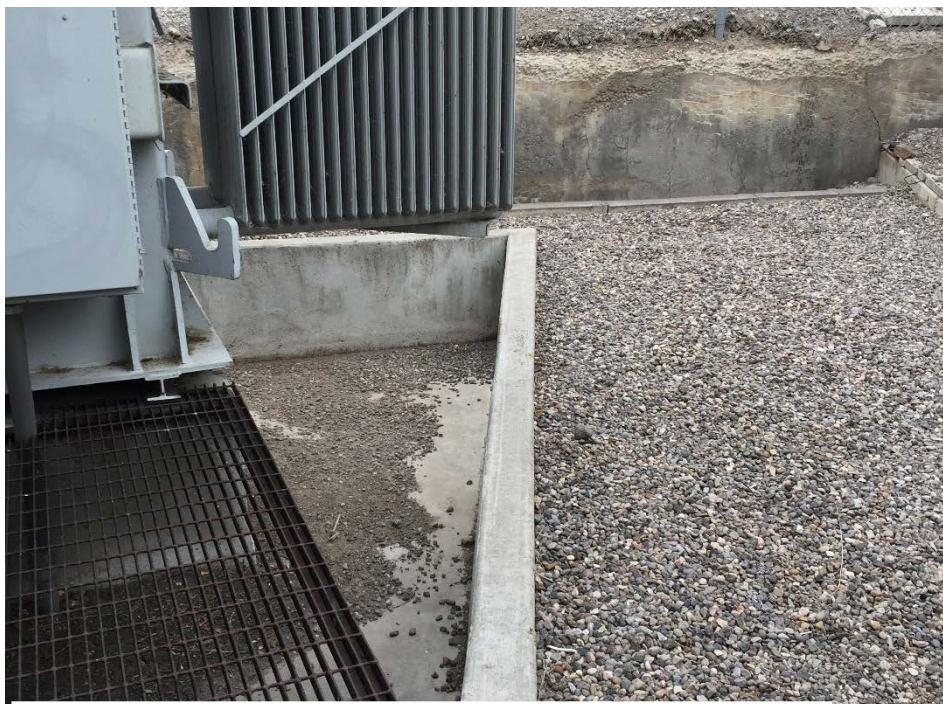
Outdoor transformer with secondary containment barrier at Ashton switchyard.
